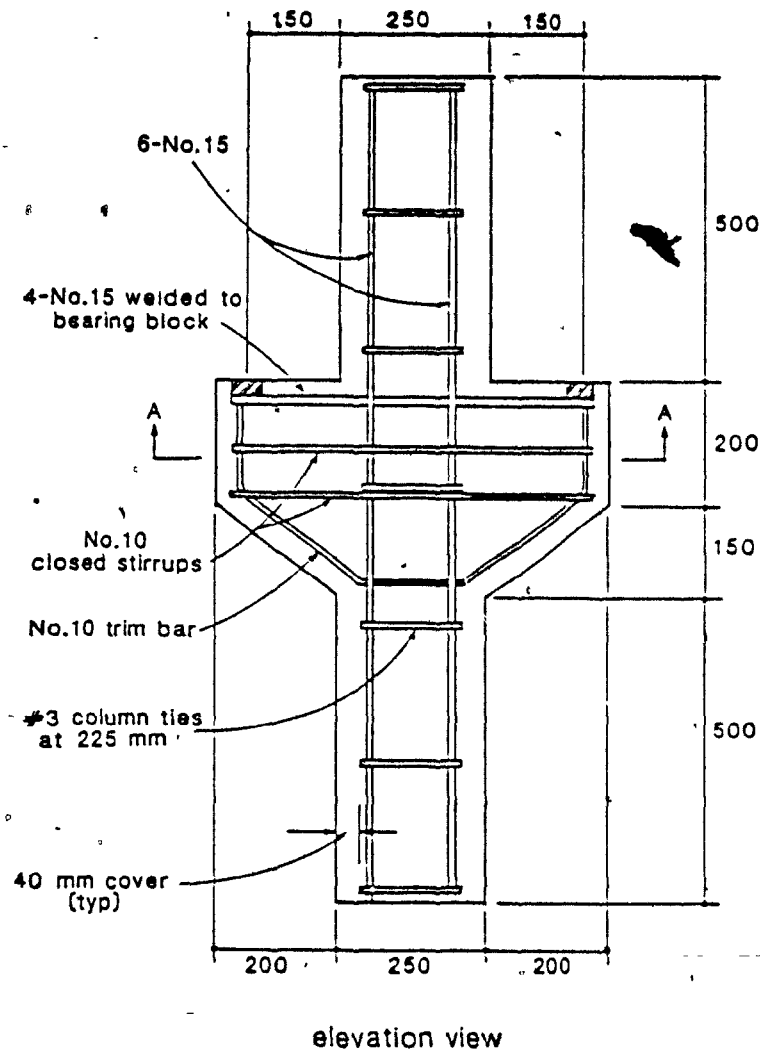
Dimensions and Reinforcement Details of Corbel Specimen C-1.
